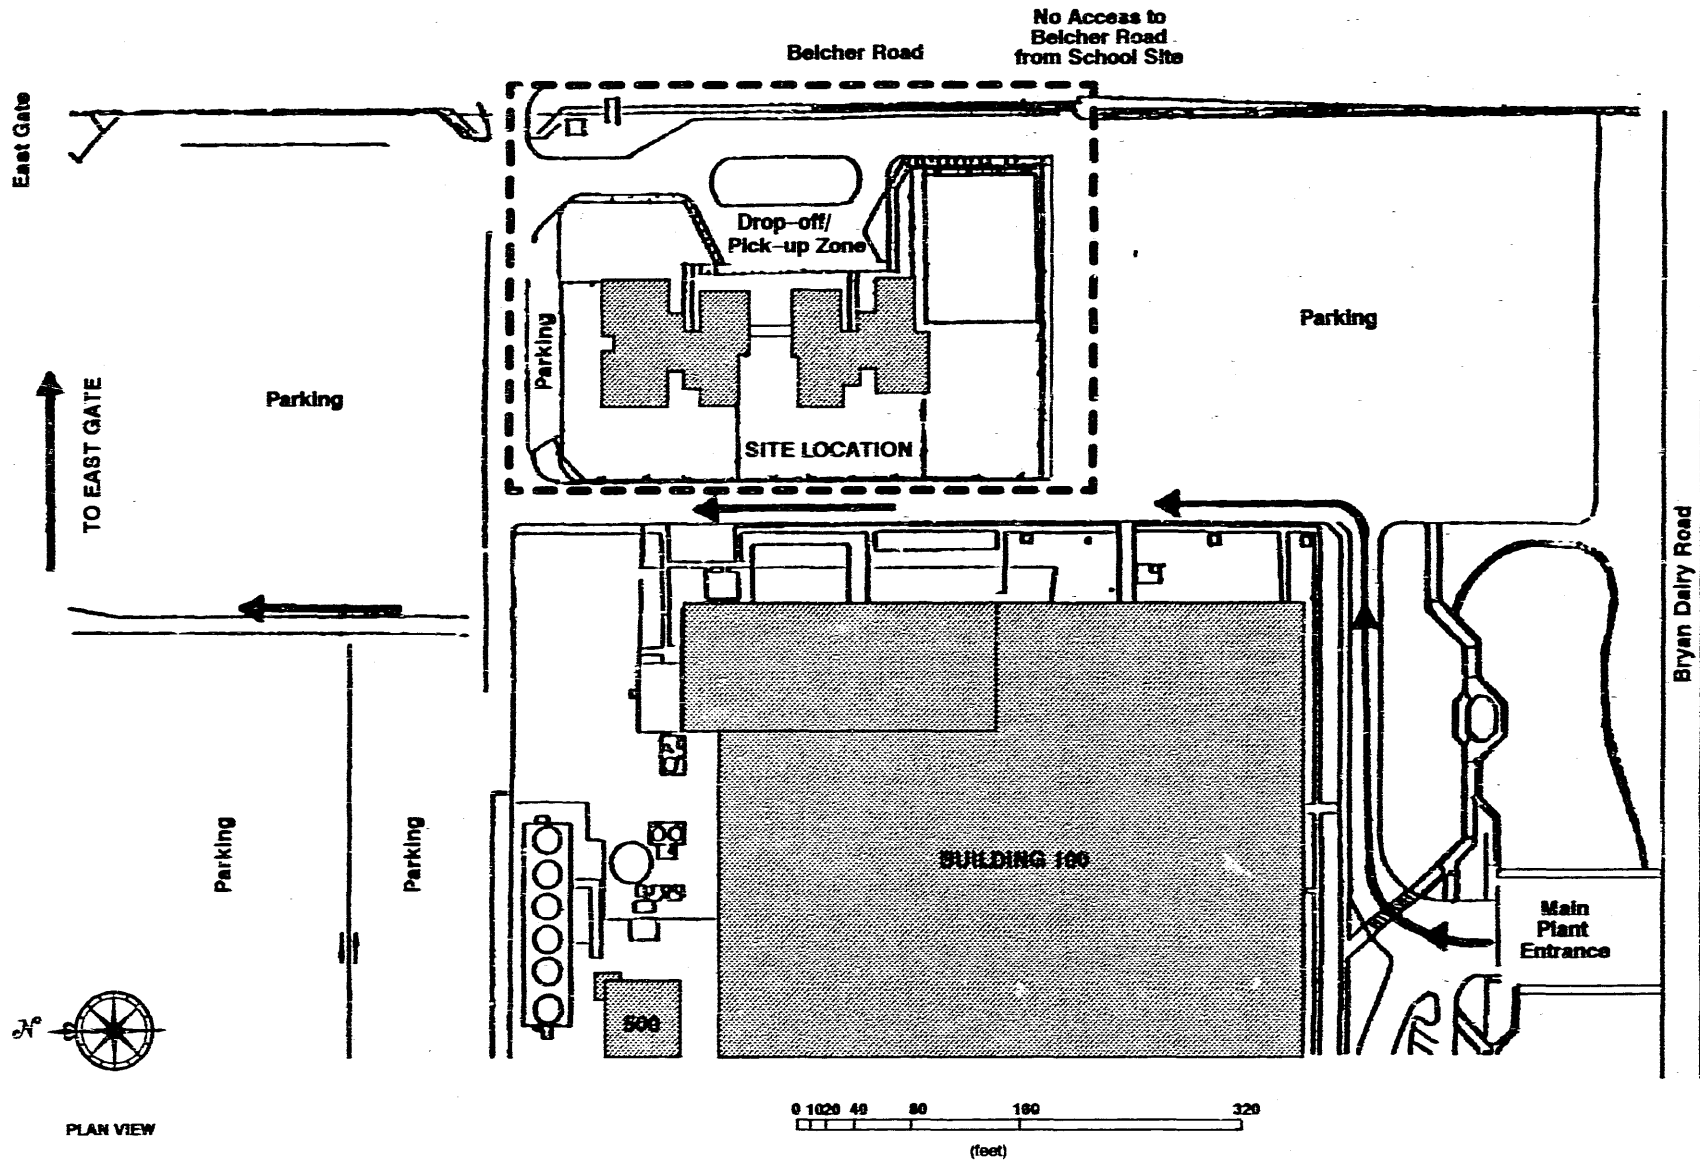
Pinellas Plant Child Development Center/Partnership School Site Location Plan
